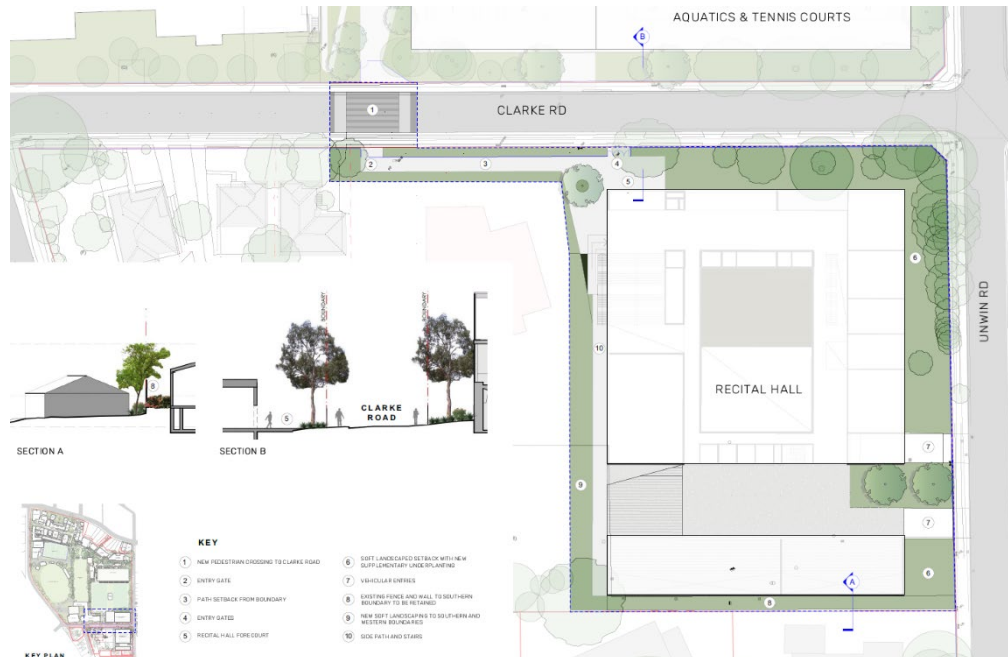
Proposed landscape works surrounding the proposed new Co-Curricular Performing Arts and Exam Centre to the south of Clarke Road. (Source: 360 Degrees Landscape Architecture)
